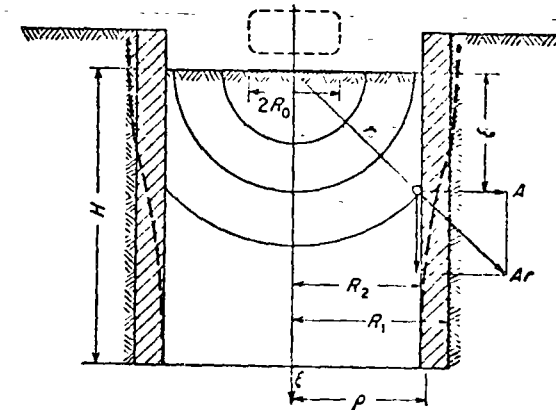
Estimation of stresses in cylindrical walls of foundation in Fig. V-21.
